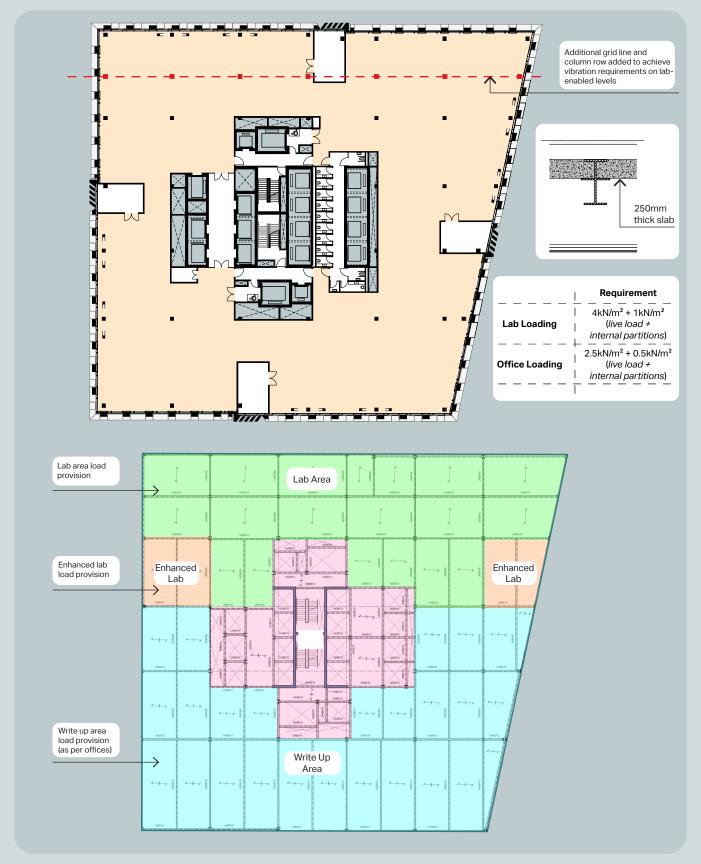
Indicative lab-enabled floorplate structural loading (above) and zoning diagram (below)
